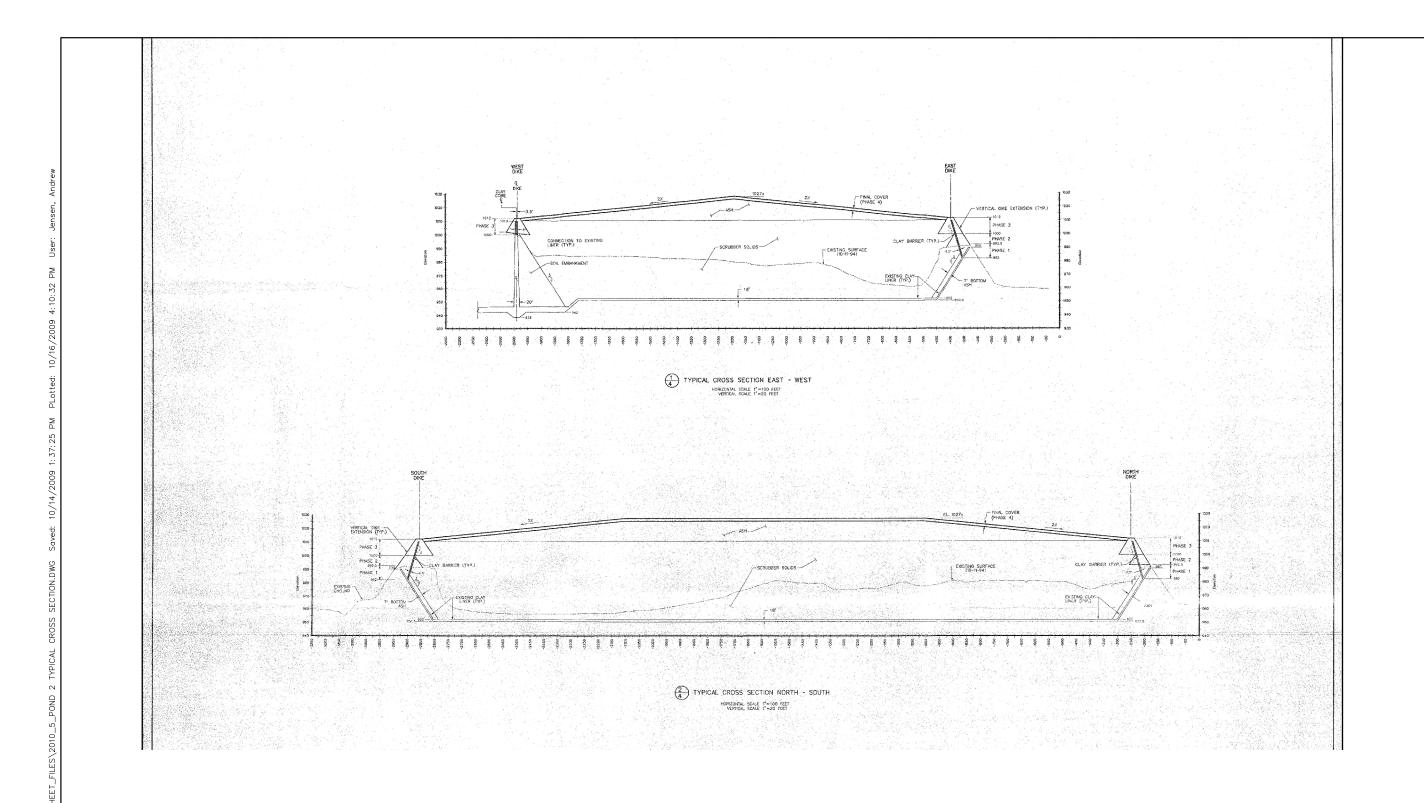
IMAGE REFERENCE: BARR ENGINEERING CO., SHERCO POND NO. 2 VERTICAL DEVELOPMENT SITE CROSS SECTIONS, 01-31-95
